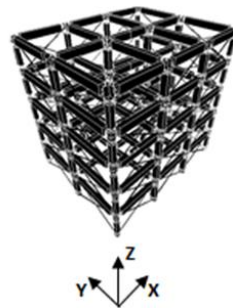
Numerical model of a building that has an irregular plan with 5 floors.
